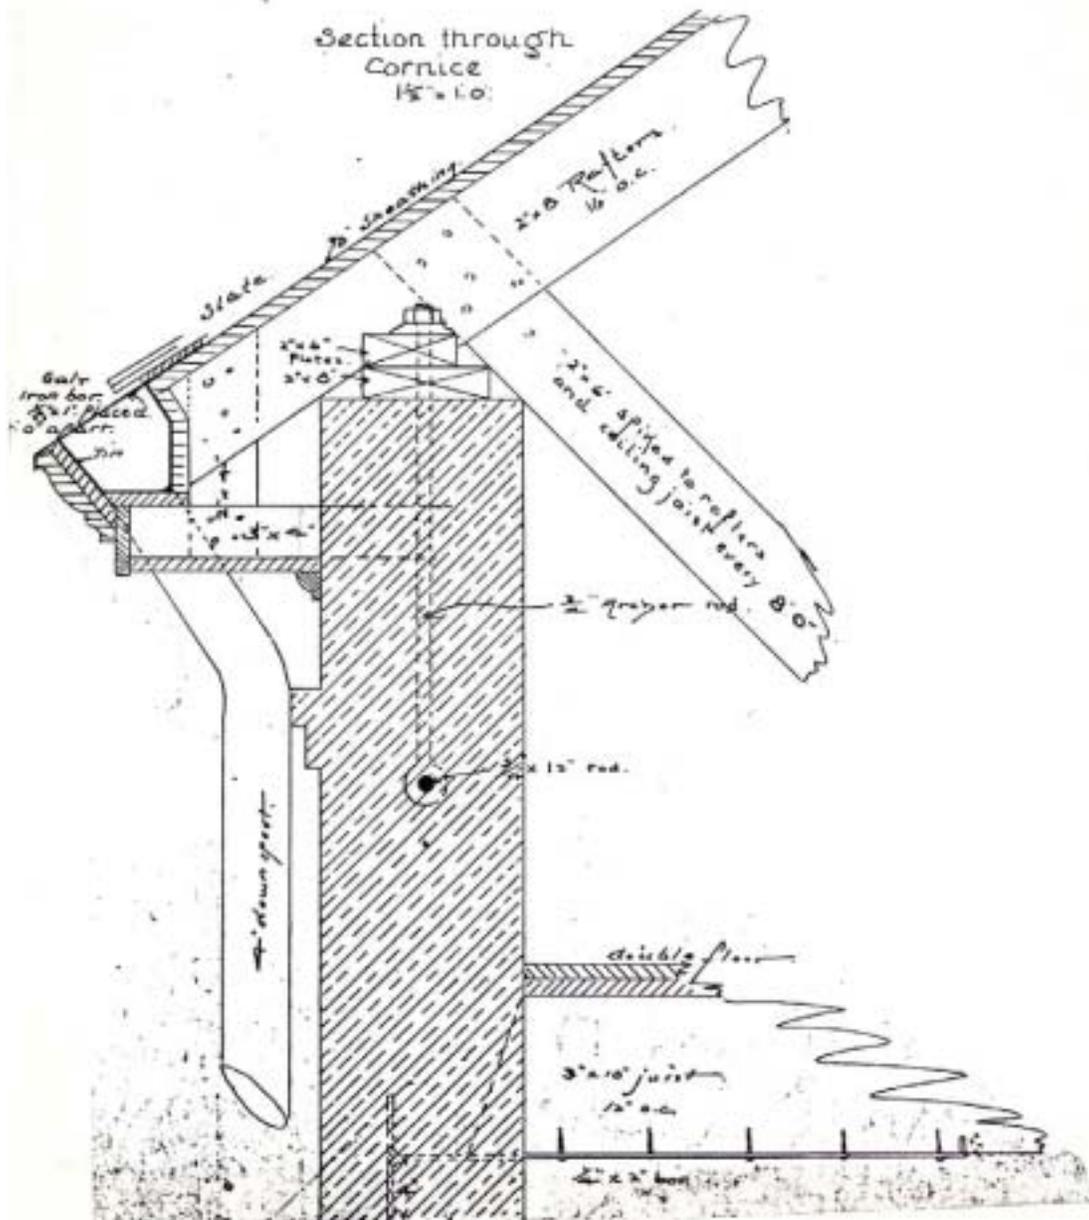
Section through the cornice as designed on original 1894 drawings (same configuration used when roof raised in 1910), showing built-in gutter, soffit, and molded fascia.
